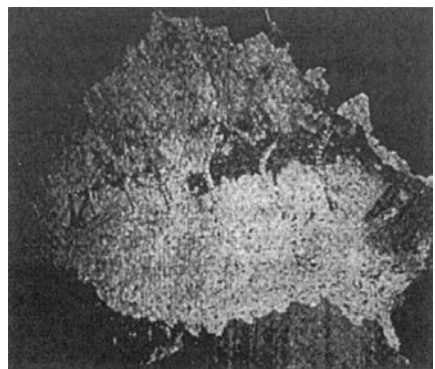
Fall of concrete lining and buckling of the reinforcing bars, Bantaki tunnel, Kobe [After Sakurai, 1995].
